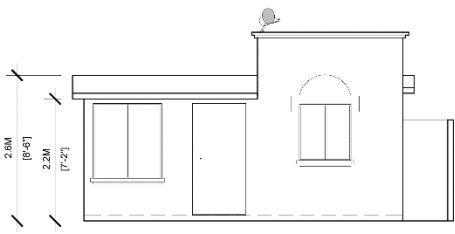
Villa Fontana House of Alejandro Ruiz. Original Plan.
